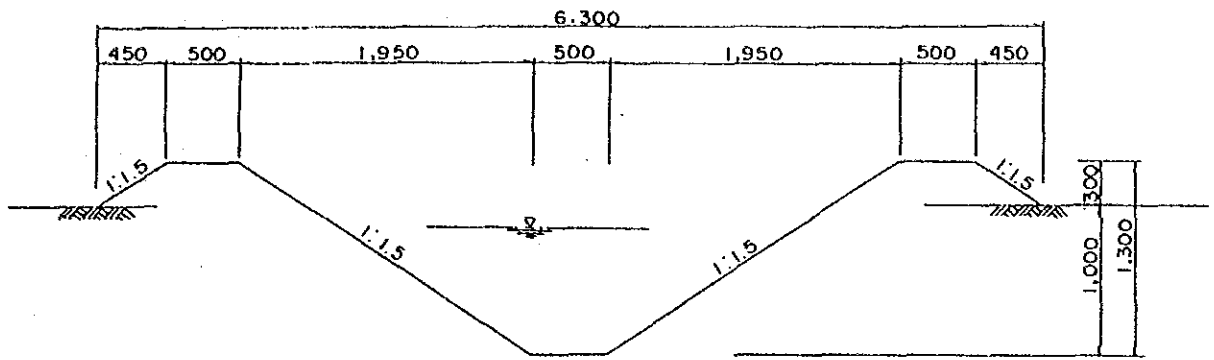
Irrigation Canal Net Work Plan at NAVUA Project
